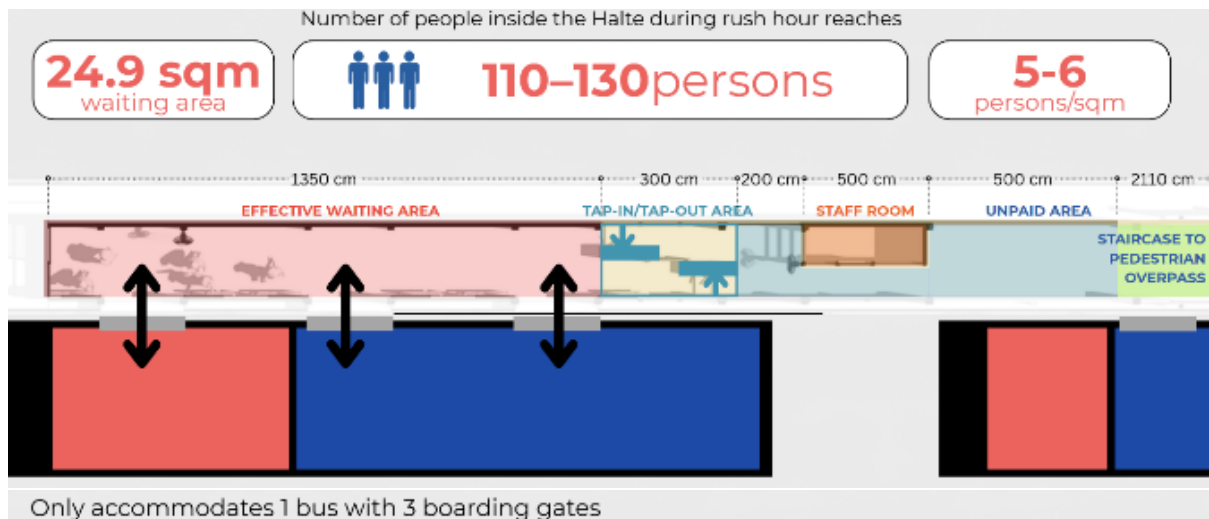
Floor Plan of Tanjung Duren BRT Stop
